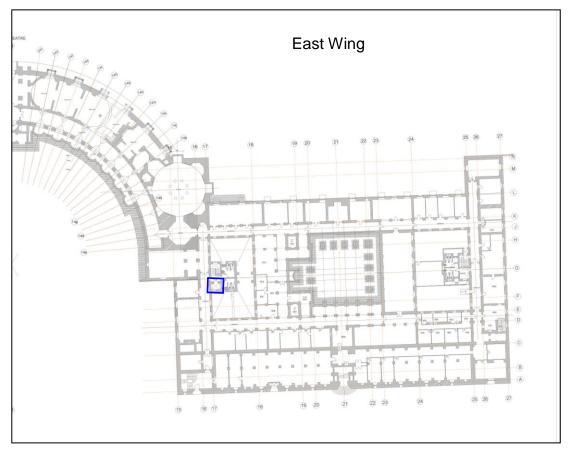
\_Union Buildings\_Overall Lower Ground Floor Plan\_Location of Lifts in East Wing (Source: Drawing Ikemeleng Architects, 2017)
